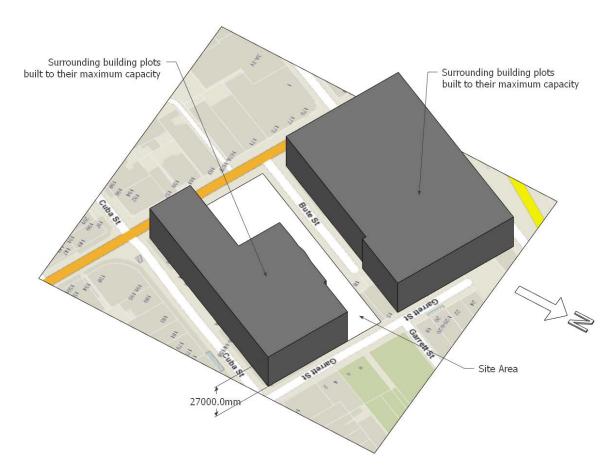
Surrounding building plots built to their maximum capacity around site.
